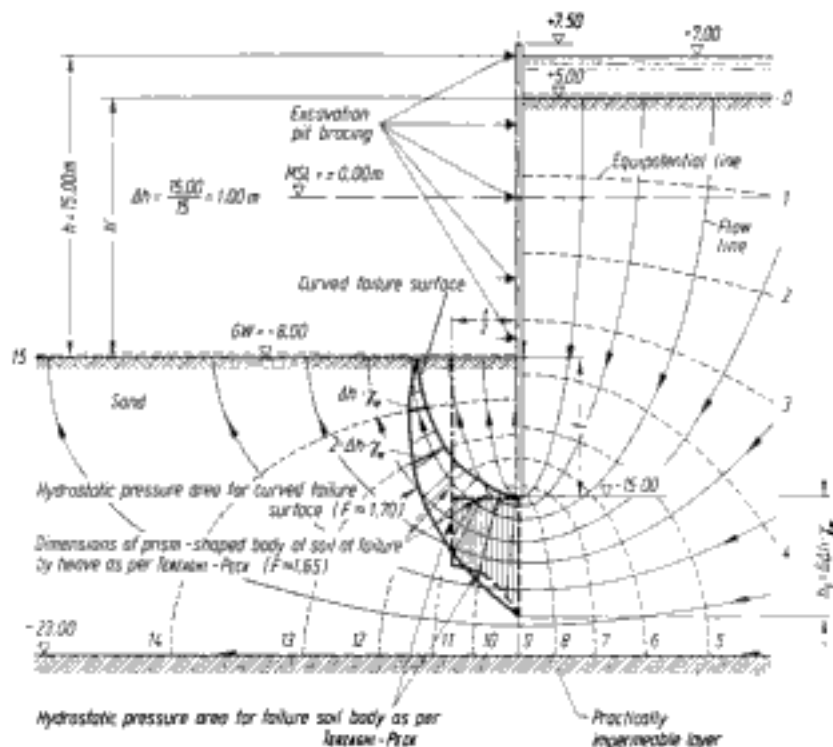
Factors of safety against failure by heave at formation level calculated using the exit gradient from the flow net with a curved failure surface and a prism-shaped failure soil body (due to Terzaghi and Peck)²⁹
